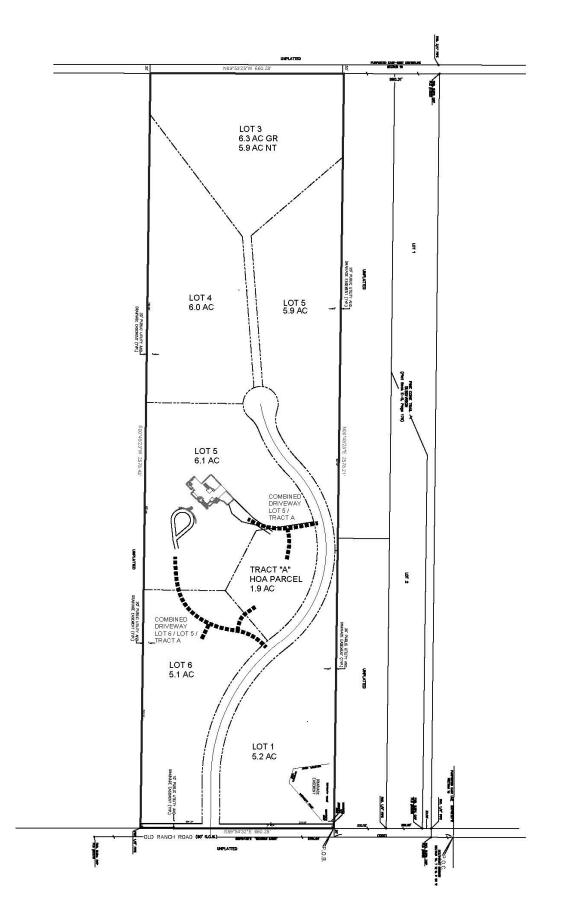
Proposed Plat showing residential planning areas and tracts. (Note: Final plan subject to change. Fire mitigation recommendations will remain the same.)
